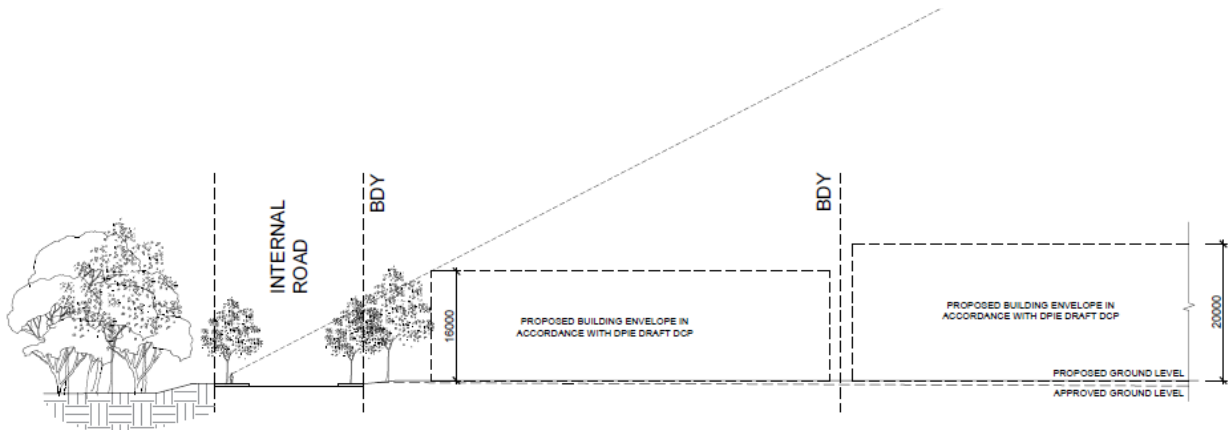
Section (Location 06) showing ground levels and viewlines in relation to riverfront land (Source: MCHP Architects)
